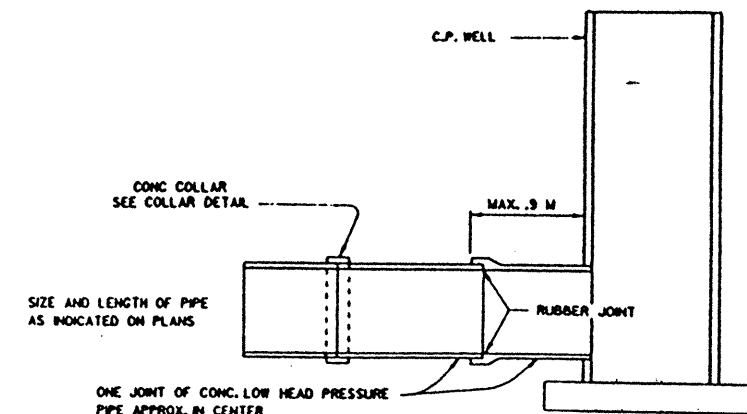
DETAIL FOR CONC. COLLARS ON PIPE SIPHONS
